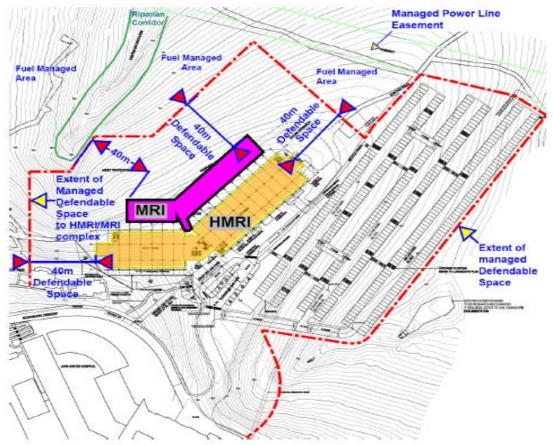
Extract Plan of Defendable Spaces (Inner Protection Zones) and Fuel Managed Areas (Outer Protection Zones per ABPP Bushfire Protection Assessment for the Construction of the Proposed Magnetic Resonance Imaging (MRI) Facility to the North of and connected to the HMRI Building per ABPP Assessment Report No. B131943 dated 1/05/2013
